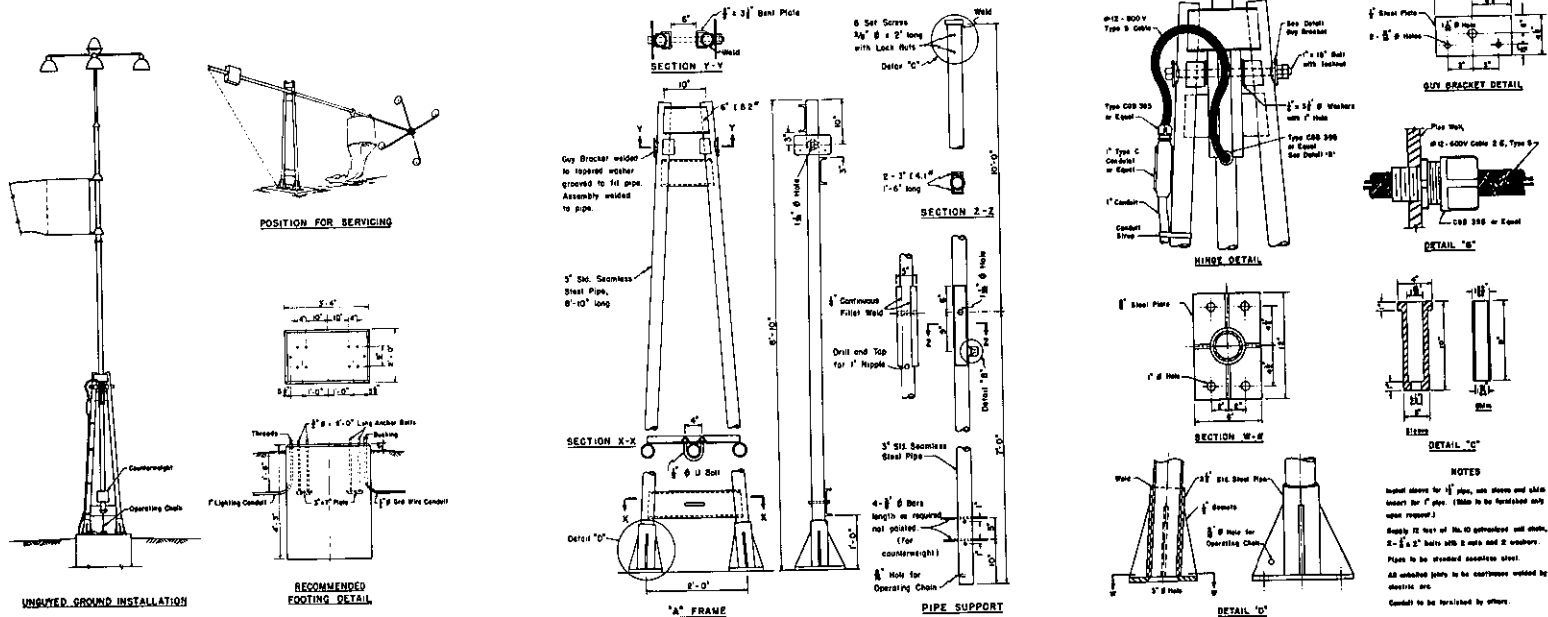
WIND CONE ASSEMBLY MOUNTED ON "A" FRAME SUPPORT
